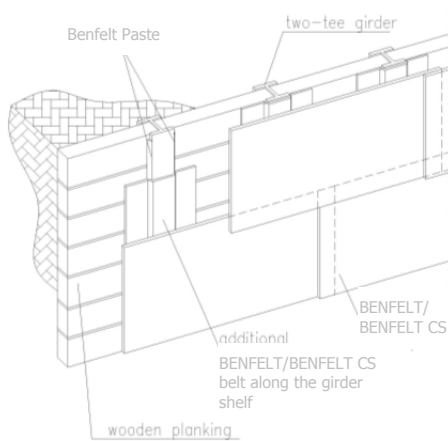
Installation of BENFELT on the fixed excavation cover development made of Berliner wall.
